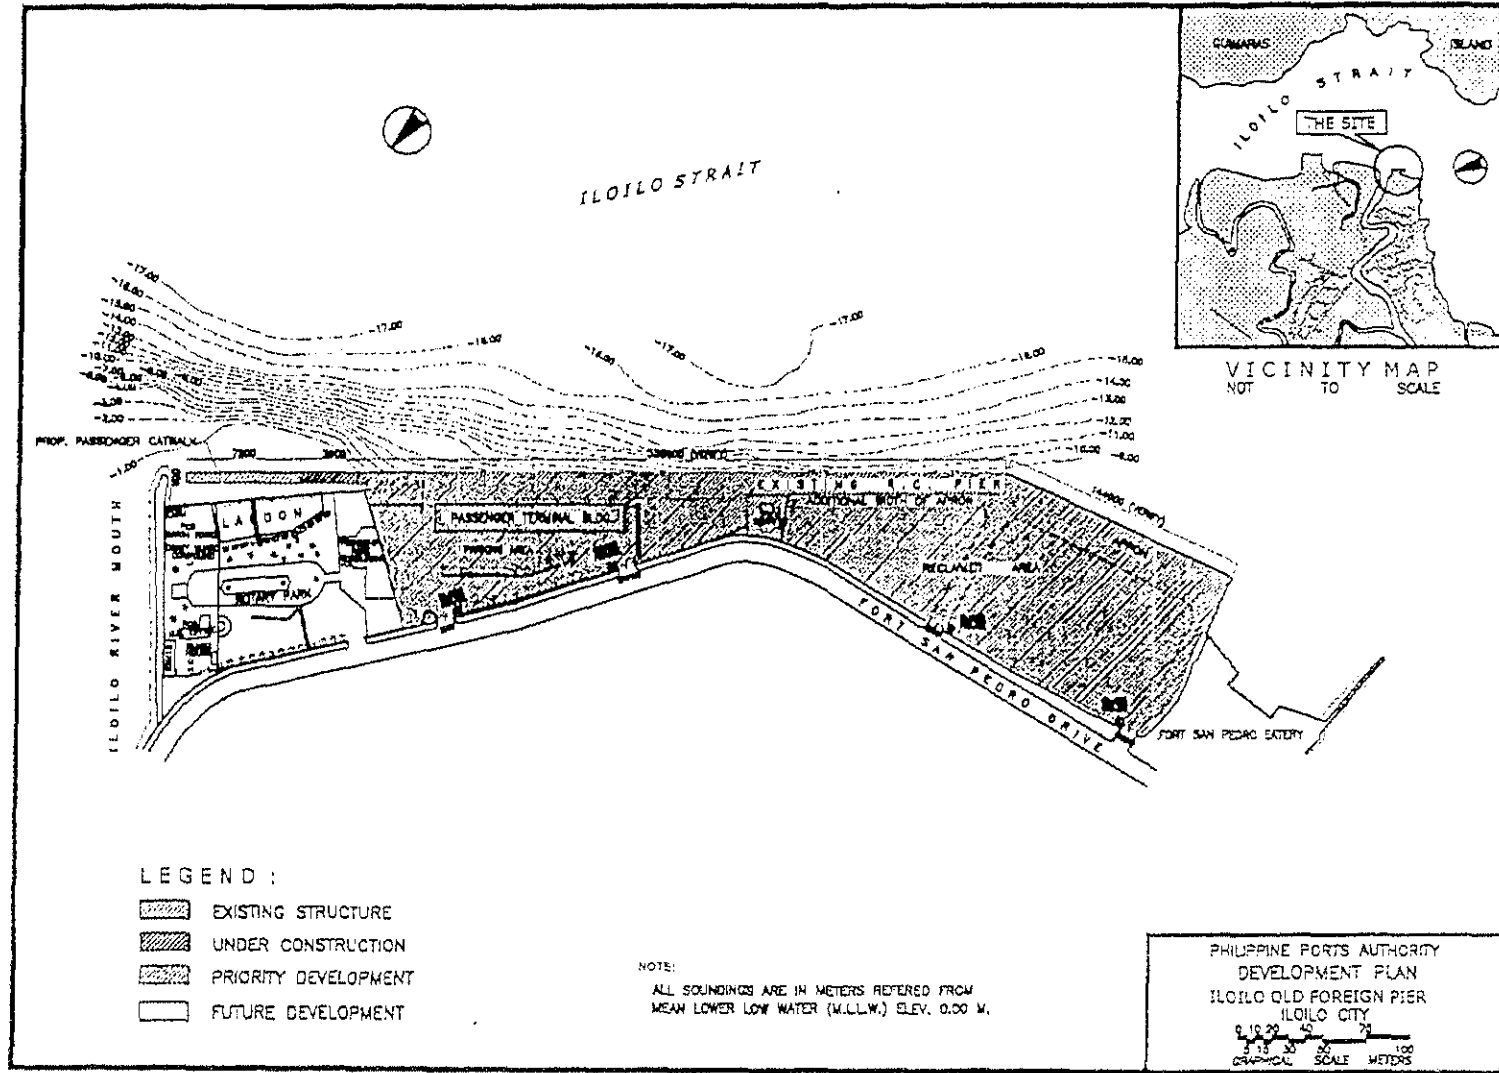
Development Plan - Port of Iloilo-Old Foreign Pier
